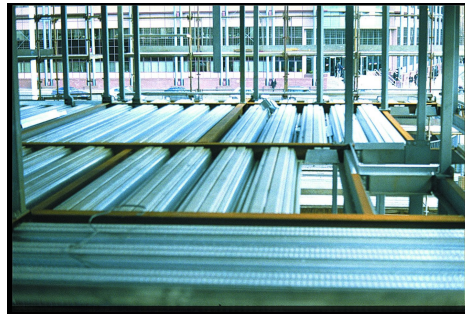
Slimdek* construction in an apartment building (before concreting)
